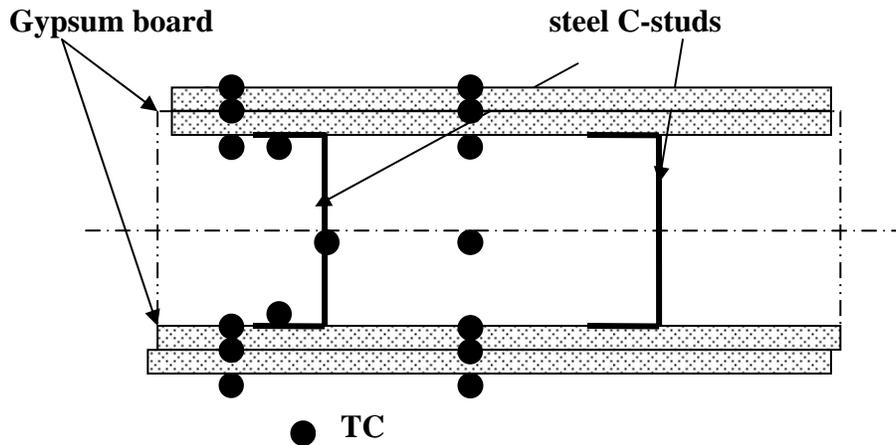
Cross-section for thermocouple (TC) layout – Wall Nos. 2 & 3.
